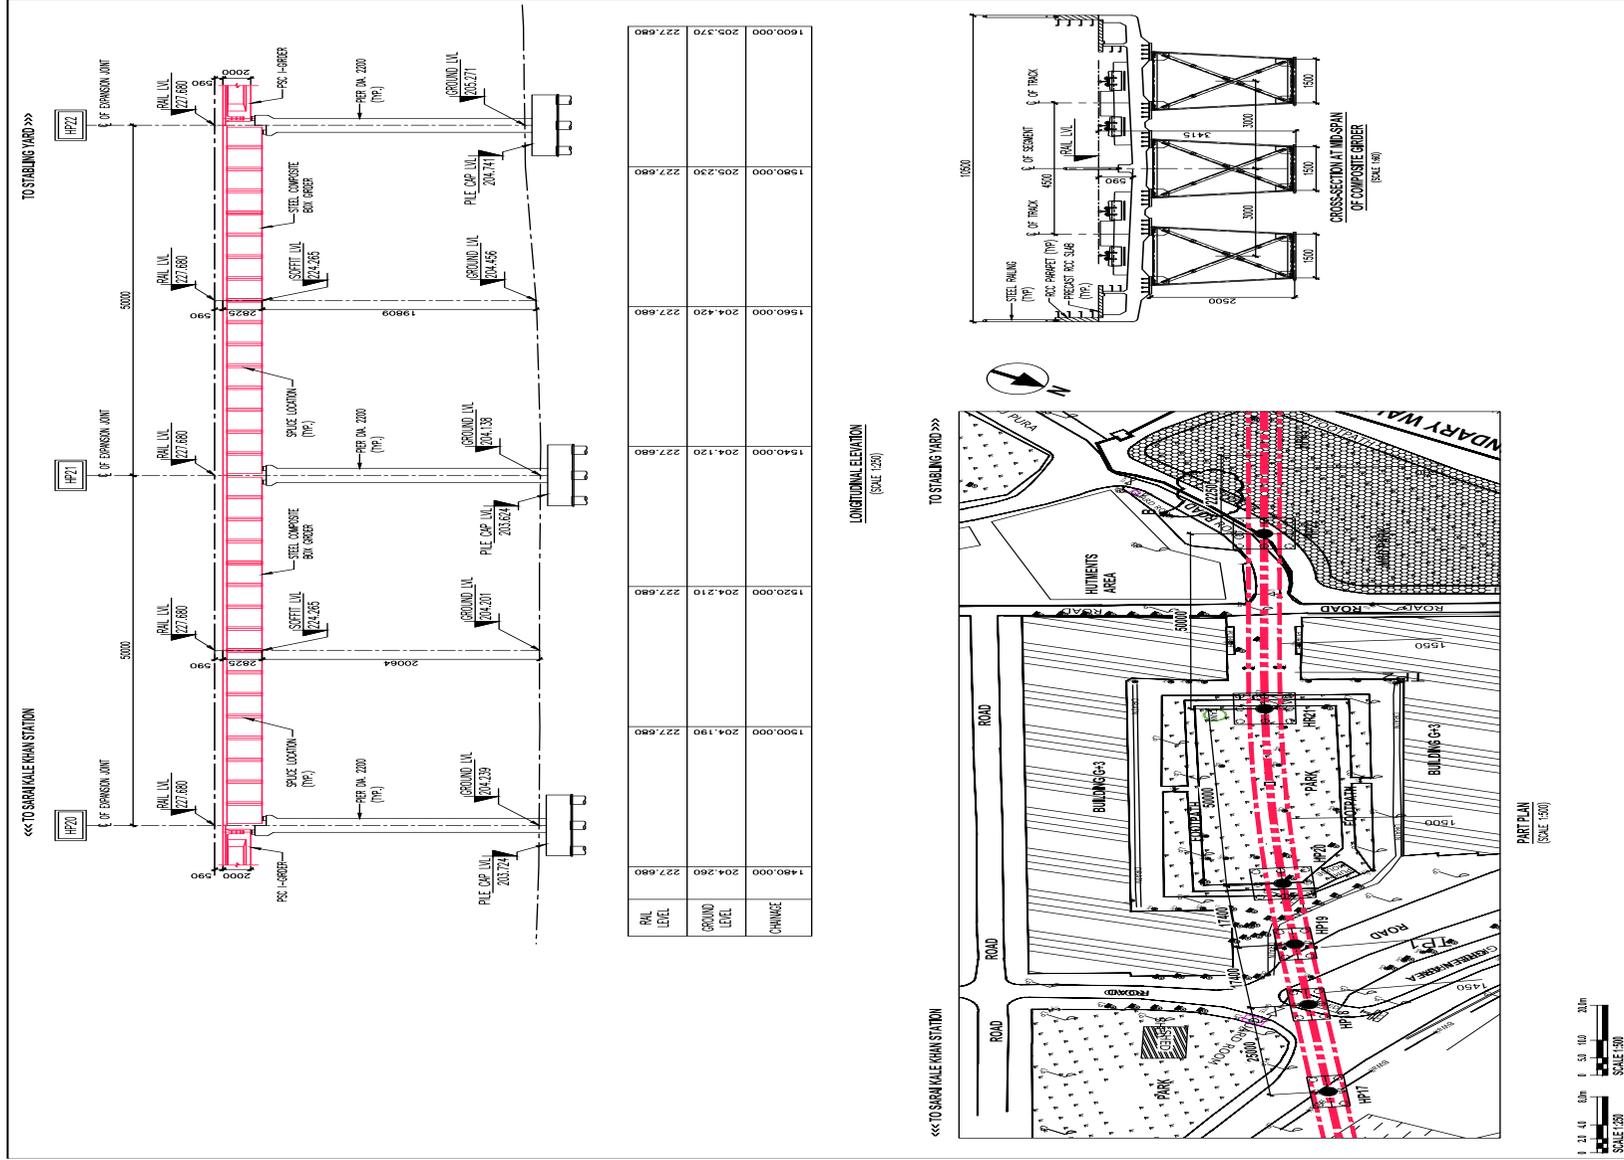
General Arrangement of Obligatory Crossings over Siddharth Extension (Stabling Yard Alignment)
